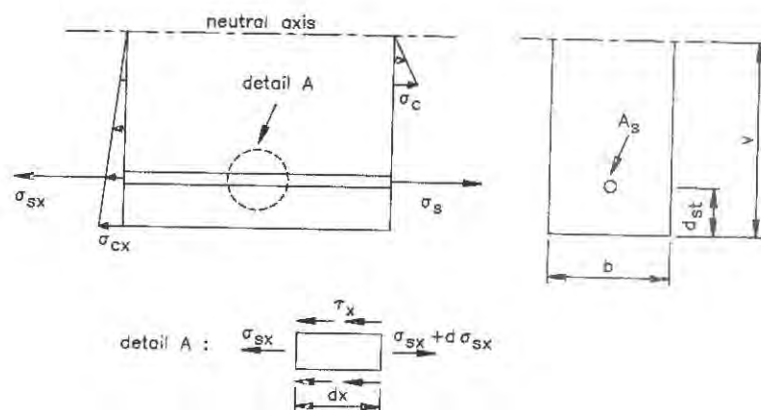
Eccentrically loaded reinforced concrete tensile bar.
